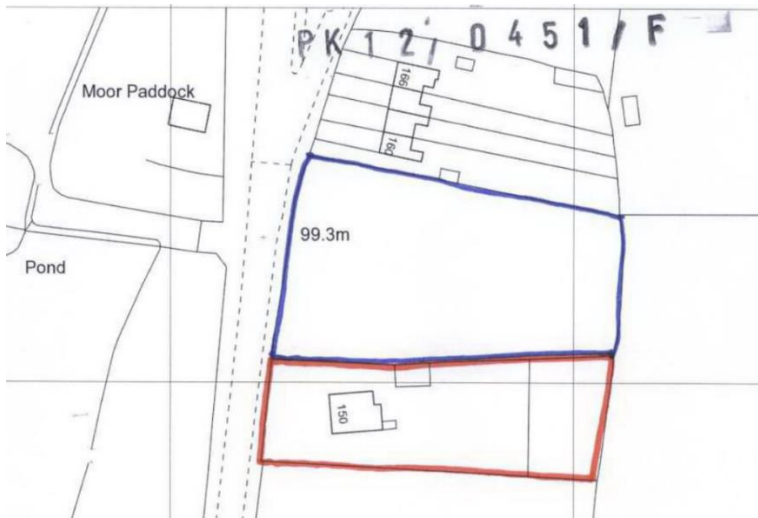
extract of Site Location Plan (ref: PK12/0451/F)
